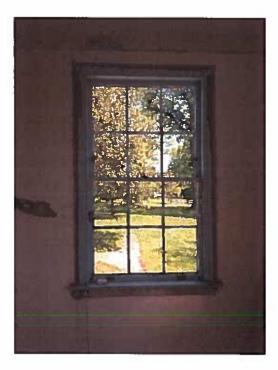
Photo K. Sash in library wing, likely dating to addition's 1942 date of construction
